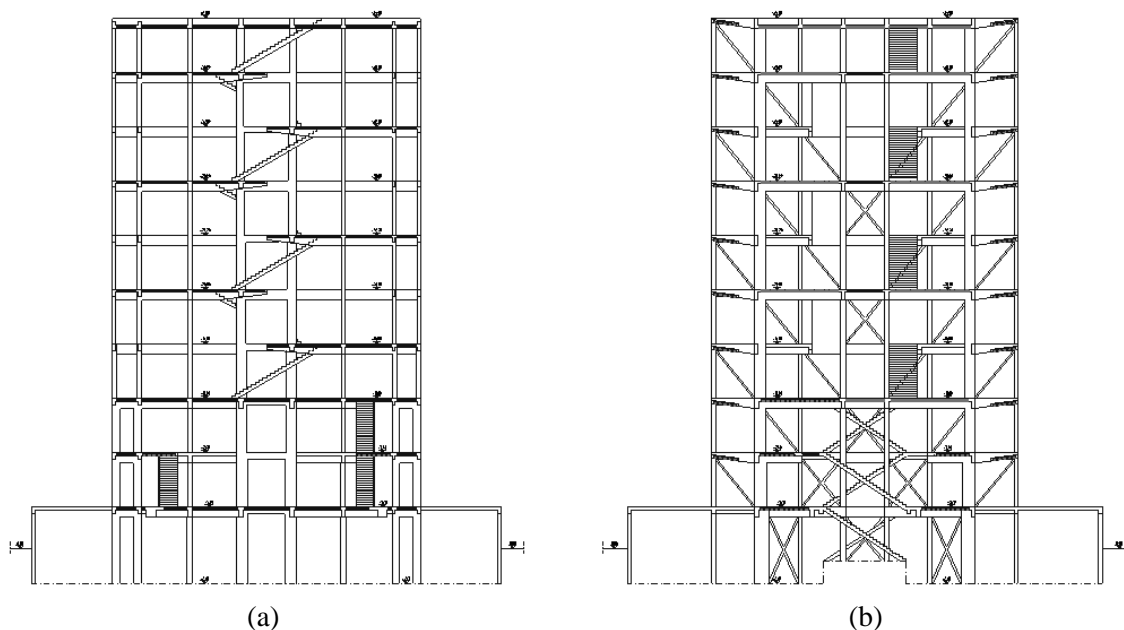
Tower of the Nations: (a) transversal (XZ); (b) longitudinal (YZ) sections
